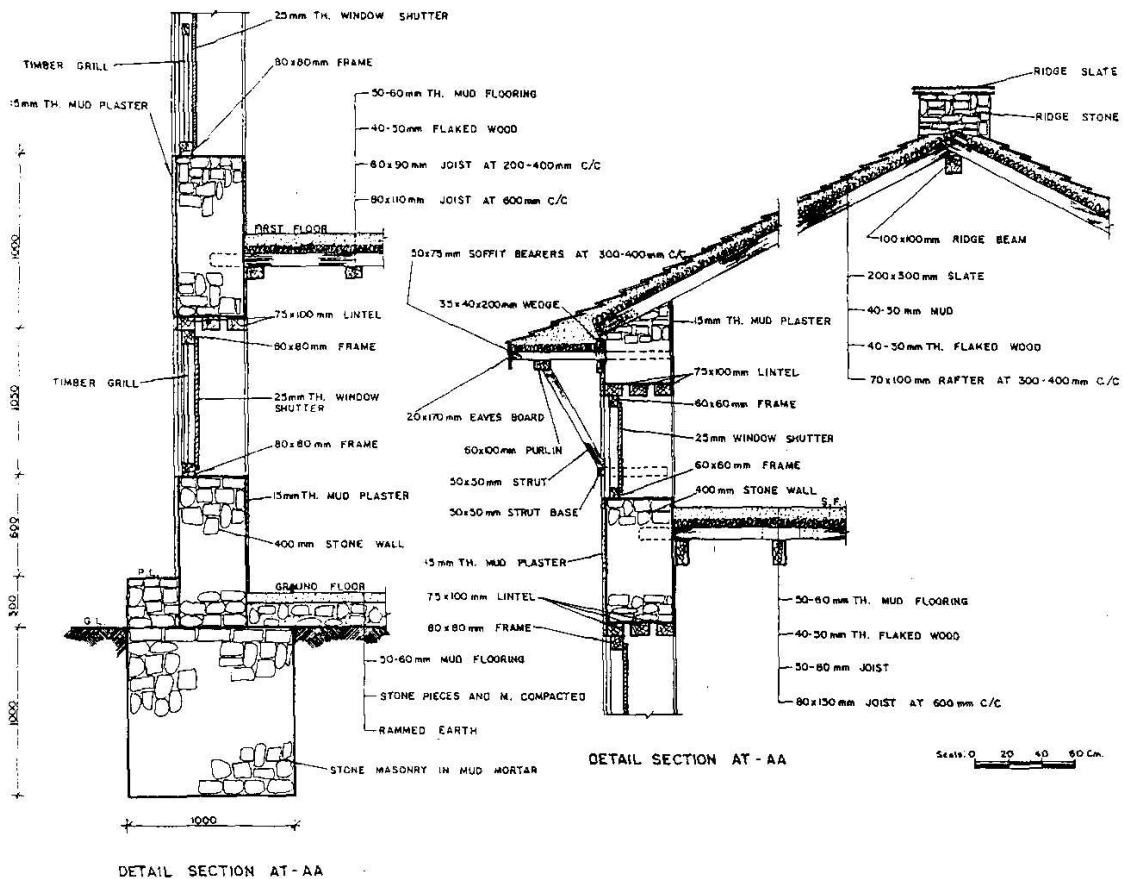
Critical Structural Details - Wall Section, Foundations, Roof-Wall Connections
